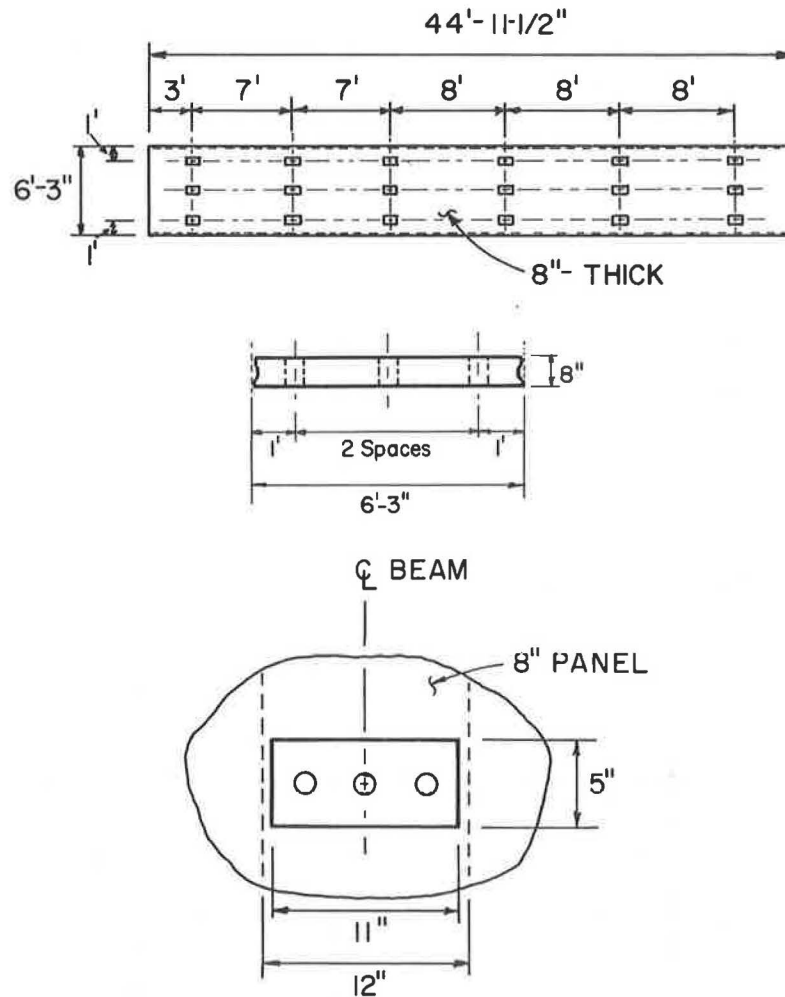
Precast panel details: top, plan view; middle, side view; and bottom, block-out hole.
